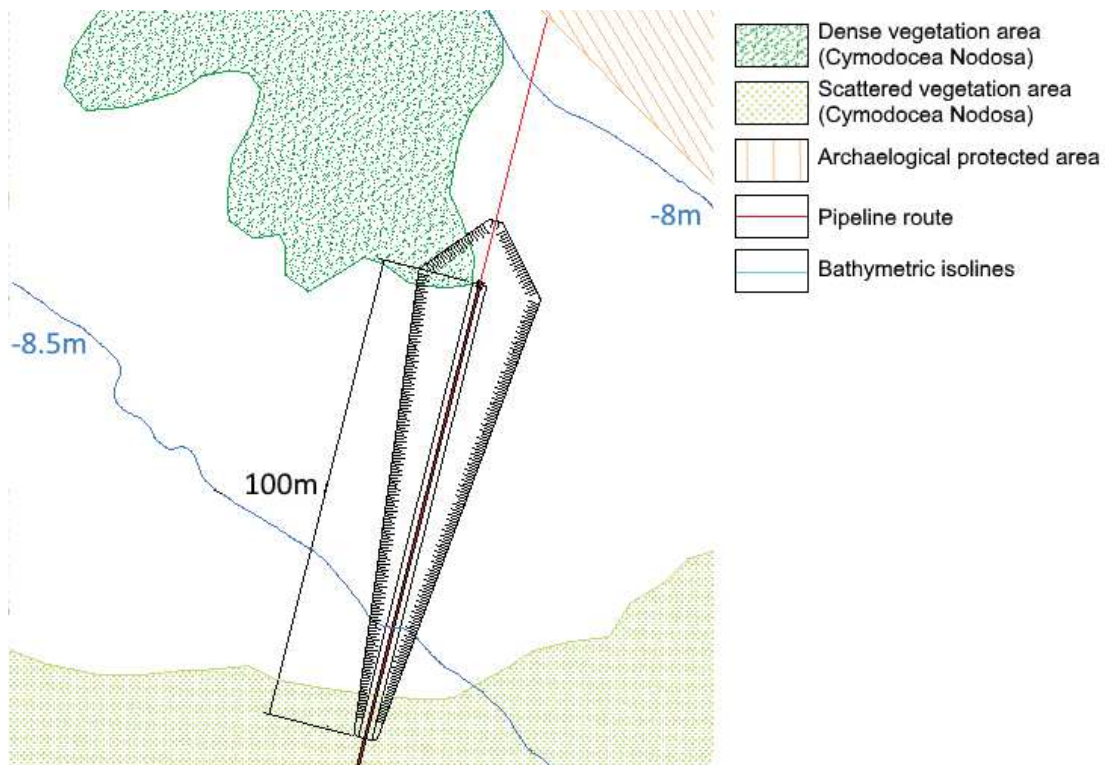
Transition trench (in black) at HDD exit at the Gela landfall site – plan view
